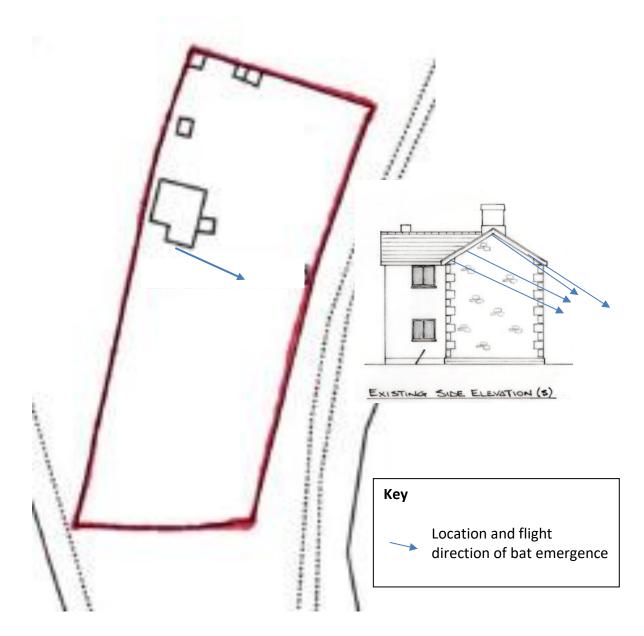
Site plan and elevation plan of Birchenwood, including locations and flight direction of bat emergences
